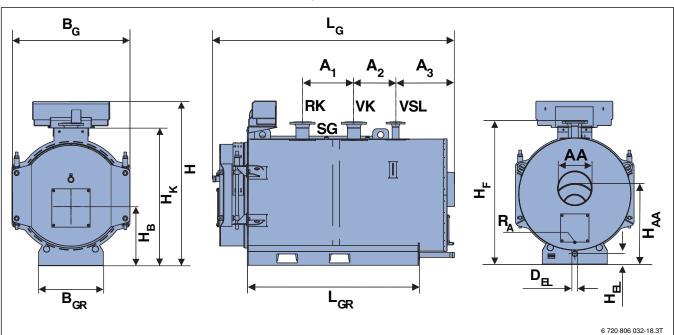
Dimensions, Uni 3000 F 120 kW to 820 kW
